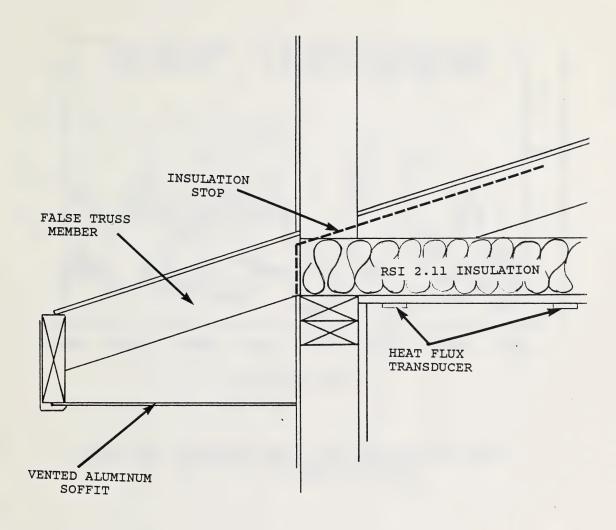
Location of Heat Flux Transducers Installed on the Ceiling of the Test House
